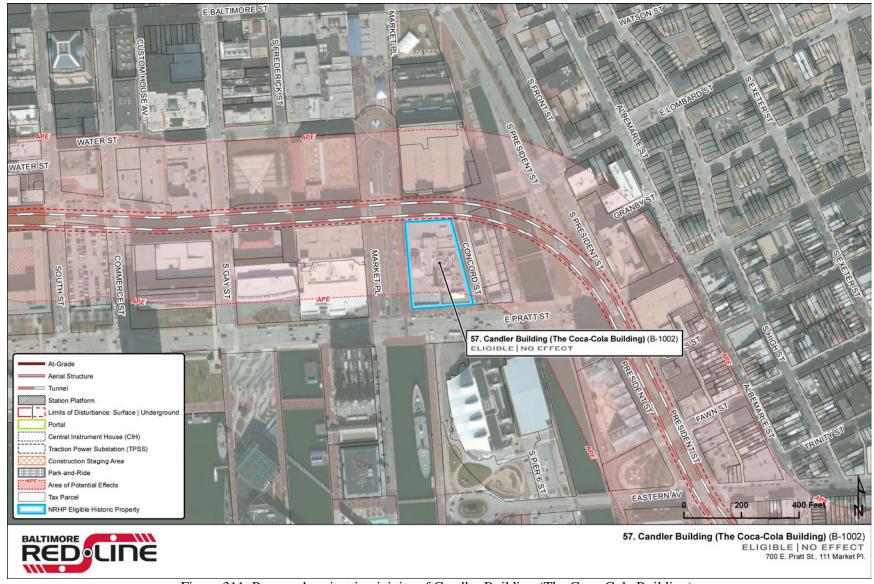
Proposed project in vicinity of Candler Building (The Coca-Cola Building)
